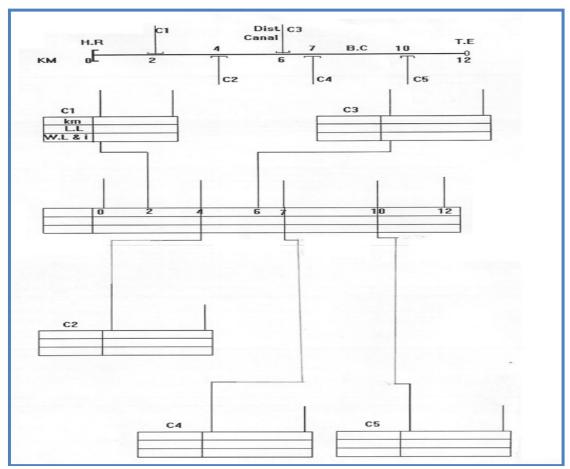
Longitudinal Section for Branch Canal and its Distributor Canals
